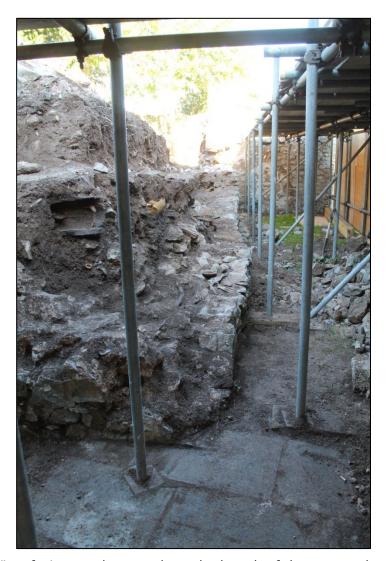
View facing north-west along the length of the eastern boundary wall (07). This photo shows the south-eastern corner of walls (06) and (07) after dismantling. Note the reduction down to the level of the flagged surface of the Old Hall garden terrace and the apparent continuation of the walls. (DAT Photo IMG_5785-108990)
